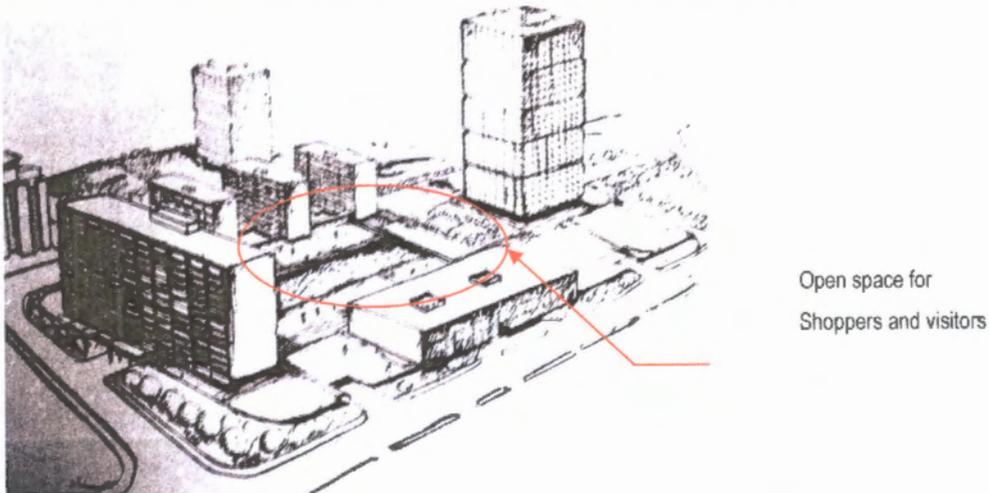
artist's sketch depicts the proposed new echelon centre of master plan 1978
